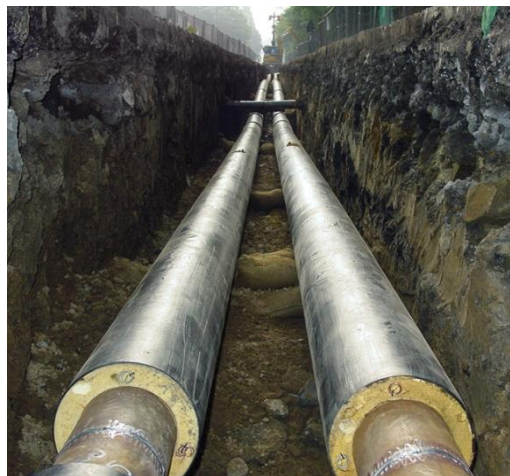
Underground installation of insulated district heating pipes (<http://www.generationparknorwich.com>)
